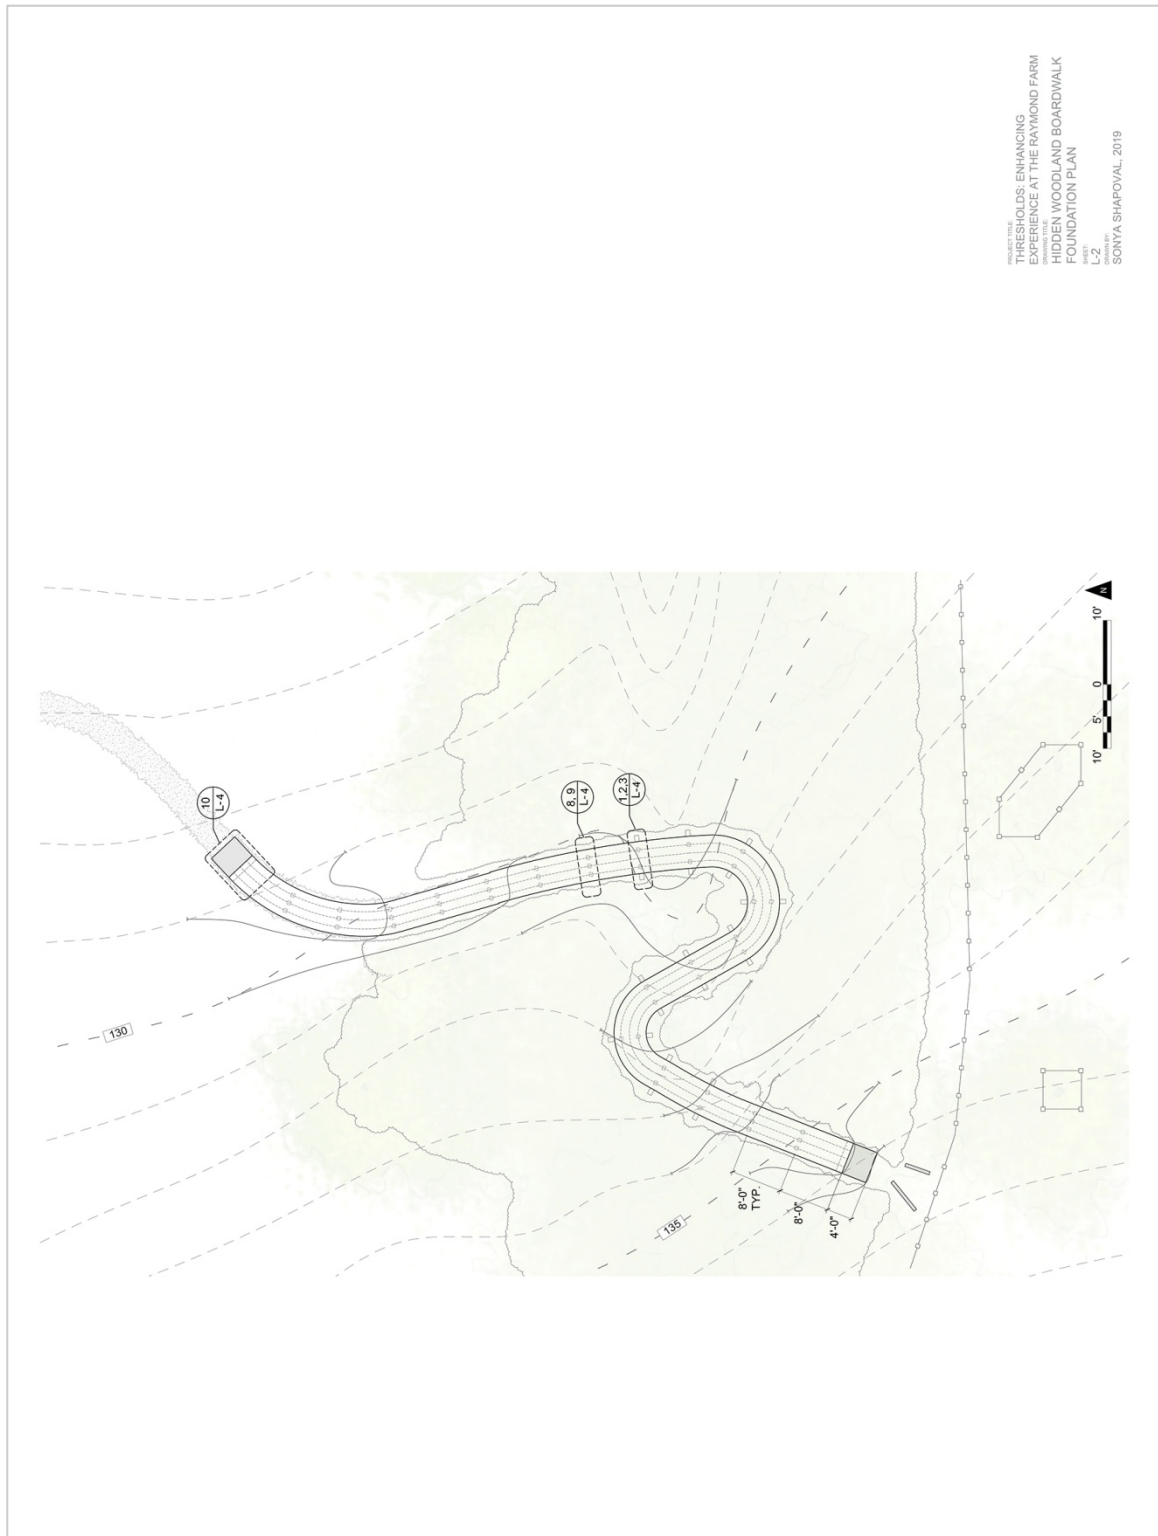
L-2 Hidden Woodland Boardwalk Foundation Plan
